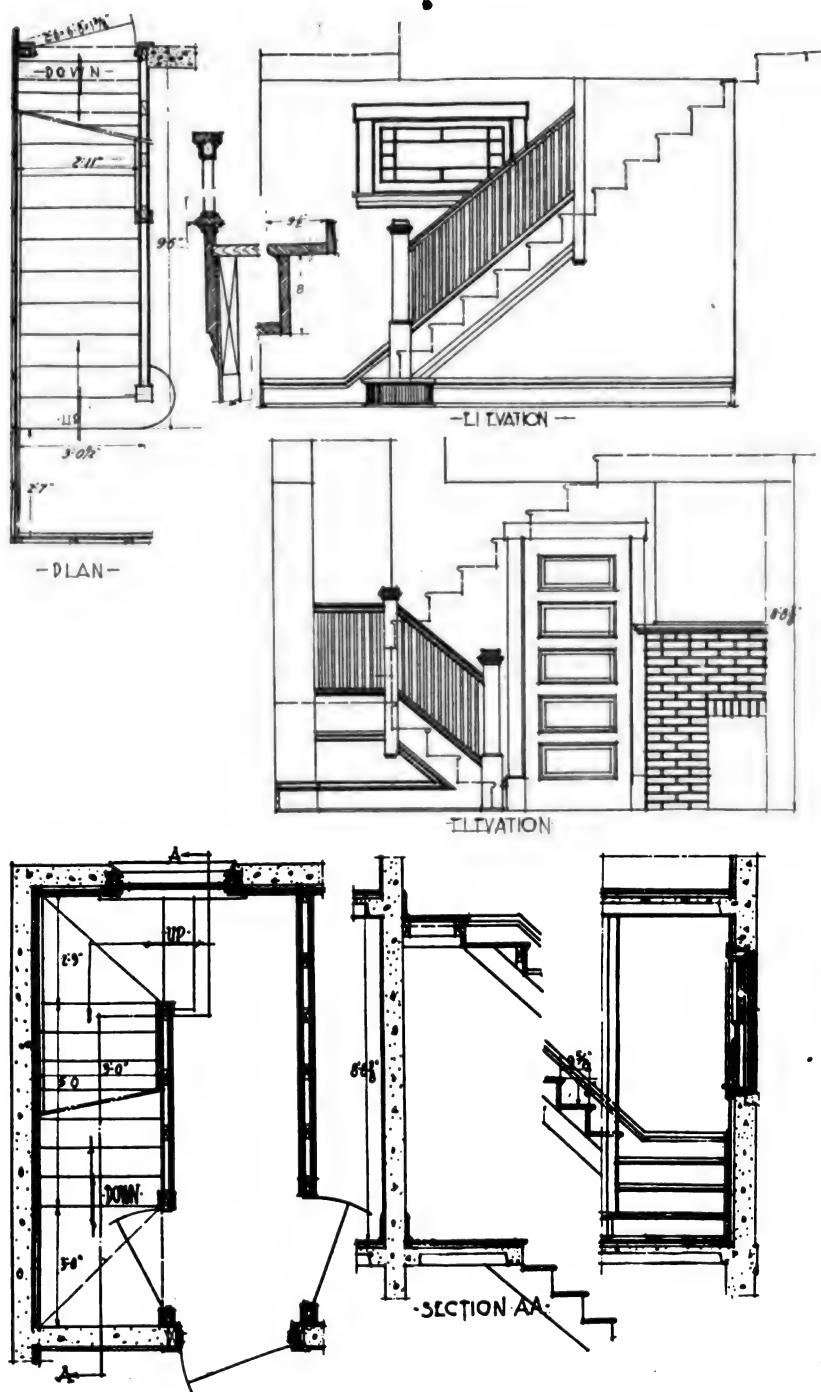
STAIRWAY DETAILS TO ACCOMPANY PLANS IN FIGS. 9, 10 AND 11
